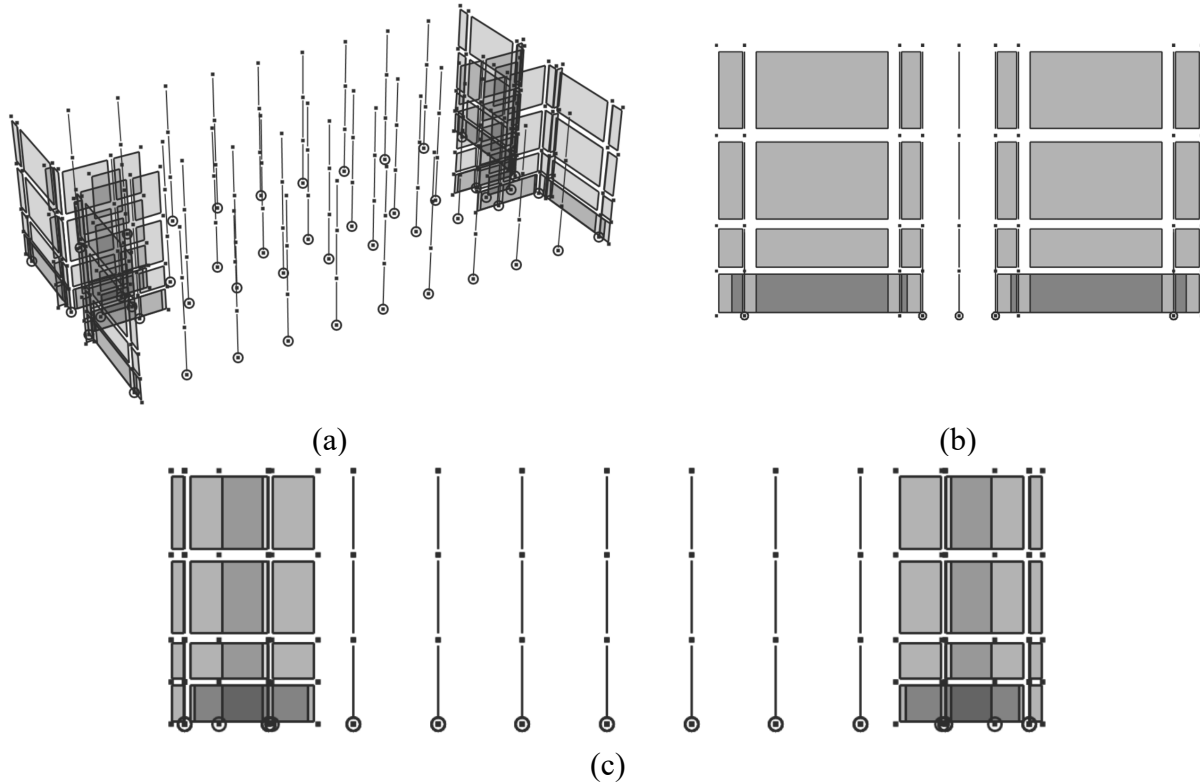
Perform3D model: (a) 3D view, (b) N-S elevation (transverse), (c) E-W elevation (longitudinal)
